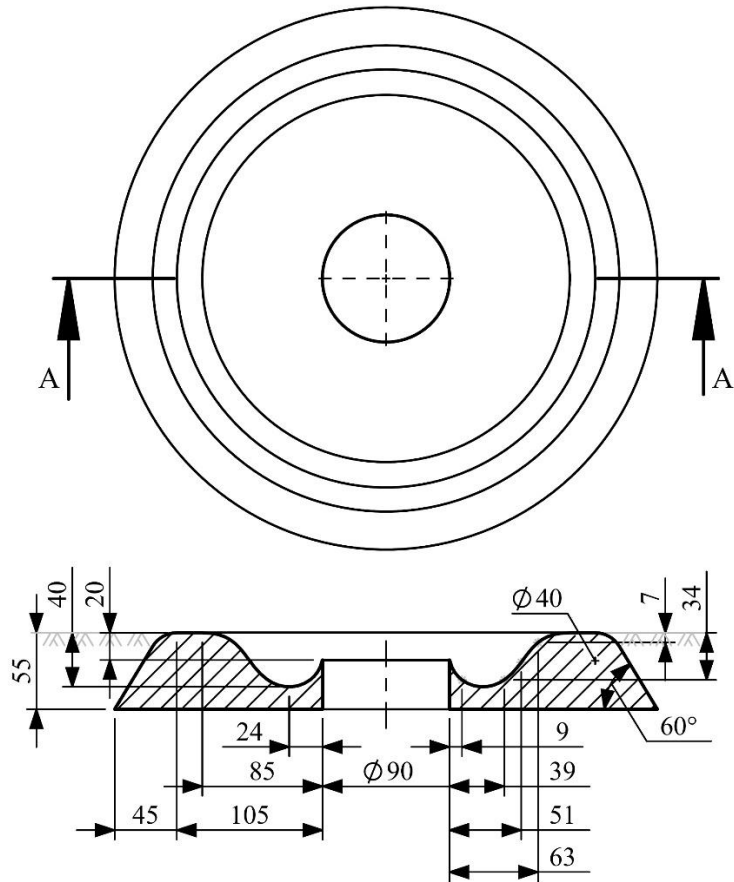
Plan and cross-section sketches of CPN3 (all dimensions in mm).
